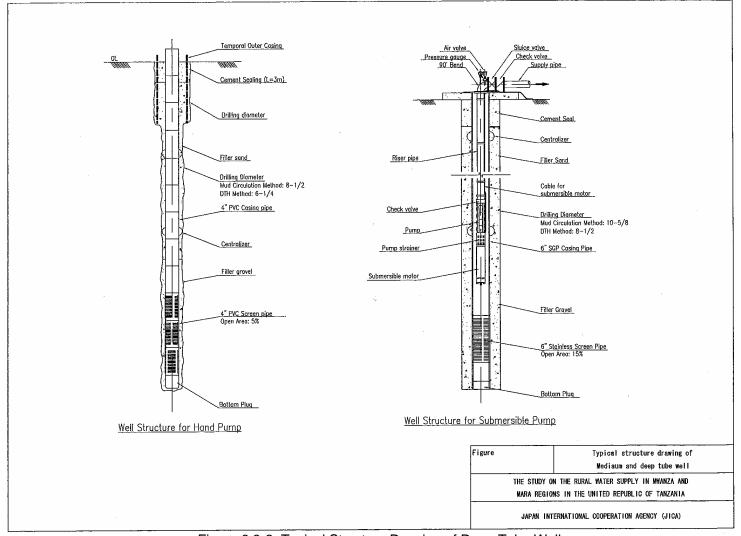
Typical Structure Drawing of Deep Tube Well
